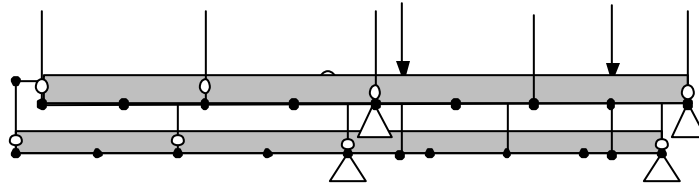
Illustration of 2-Span Bridge Chord, Rods are Hinge Elements,
